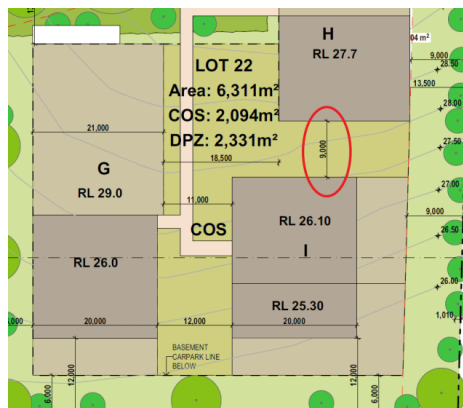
Building Envelope Plan of Buildings G, H and I [M02, Rev D] identifying setbacks between buildings that have not been adequately addressed.
